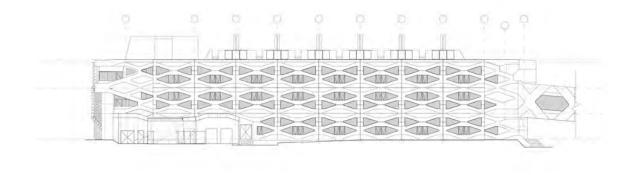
South Elevation (ArchDaily 2012)
